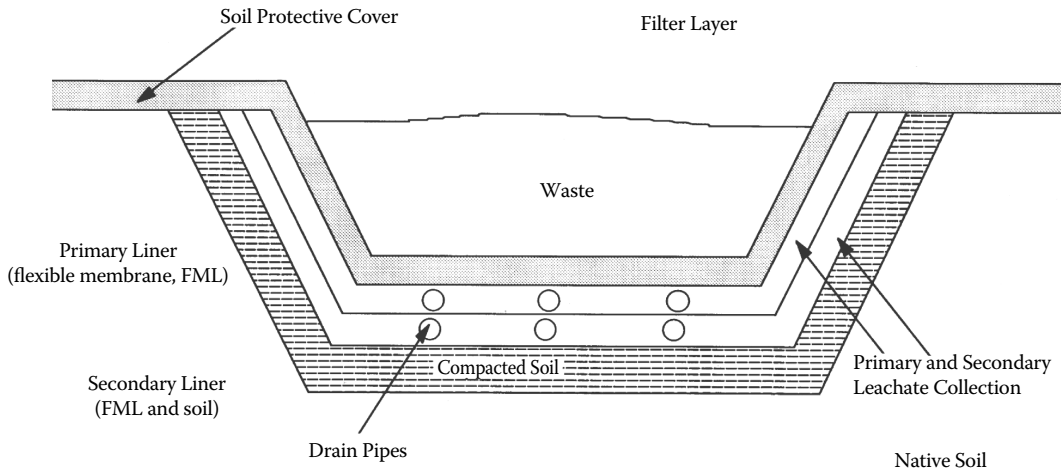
Cross-section of a secure landfill double liner system.
